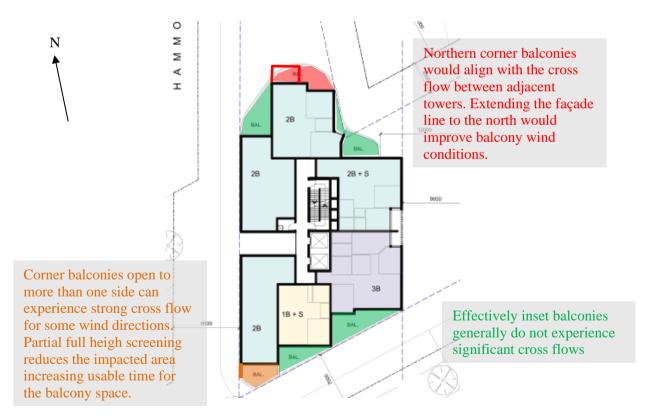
Typical tower floor plan (Level 8-19) marked up for wind from the North-East.
